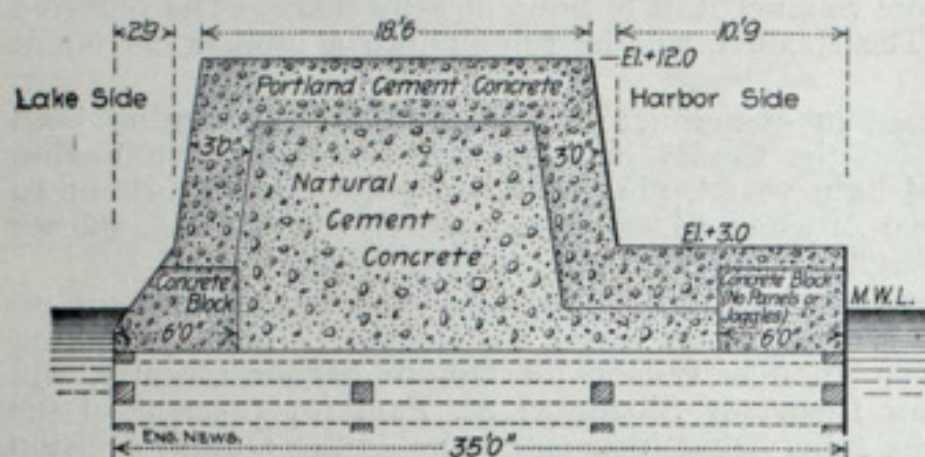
Typical cross-section of old concrete superstructure for Buffalo breakwater, 1887-1891.
